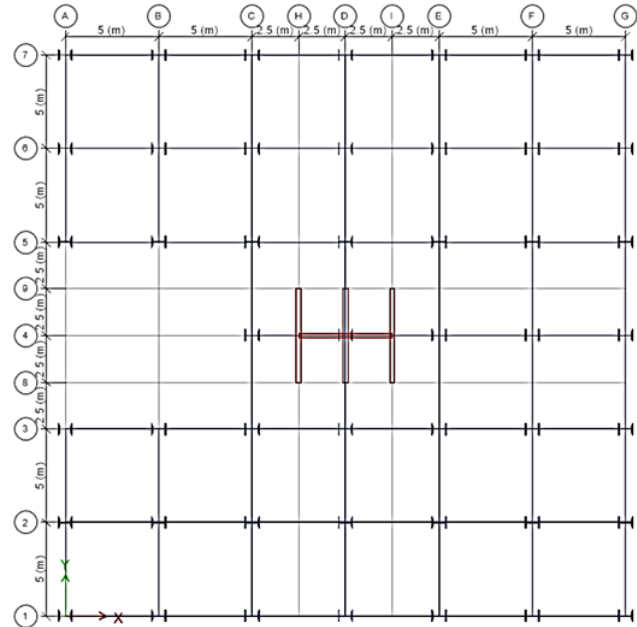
Typical plan for 10 & 20 storey asymmetrical building
